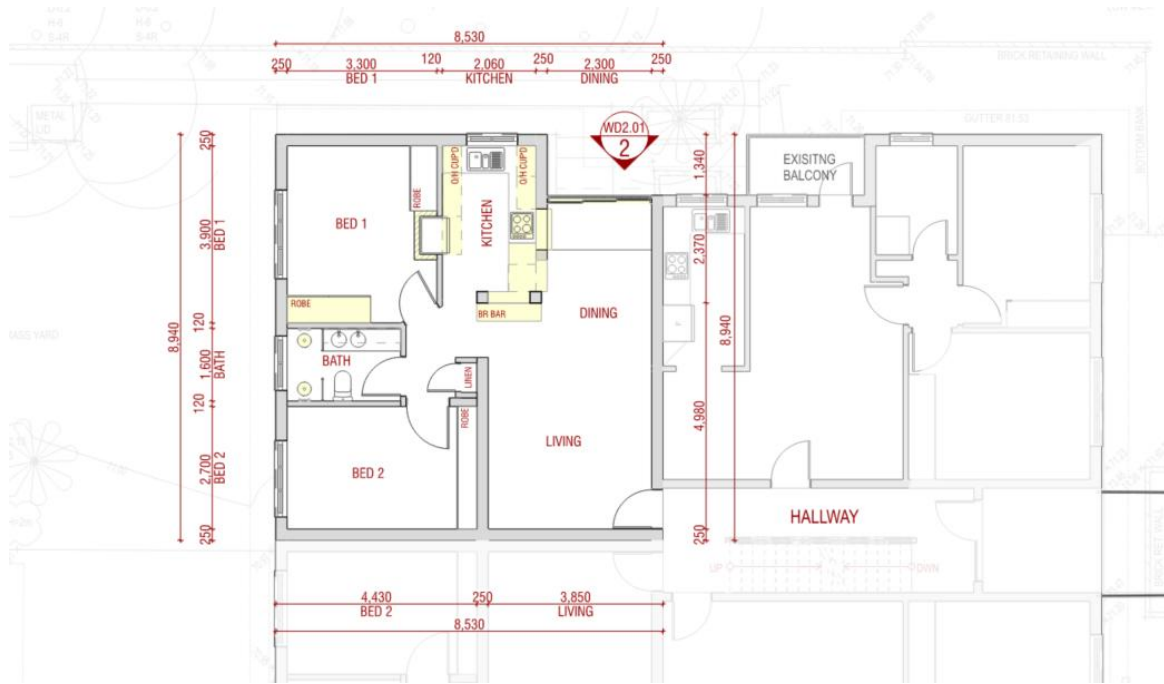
Proposed Floor Plan (Source: Maya Sternberg Architects)
